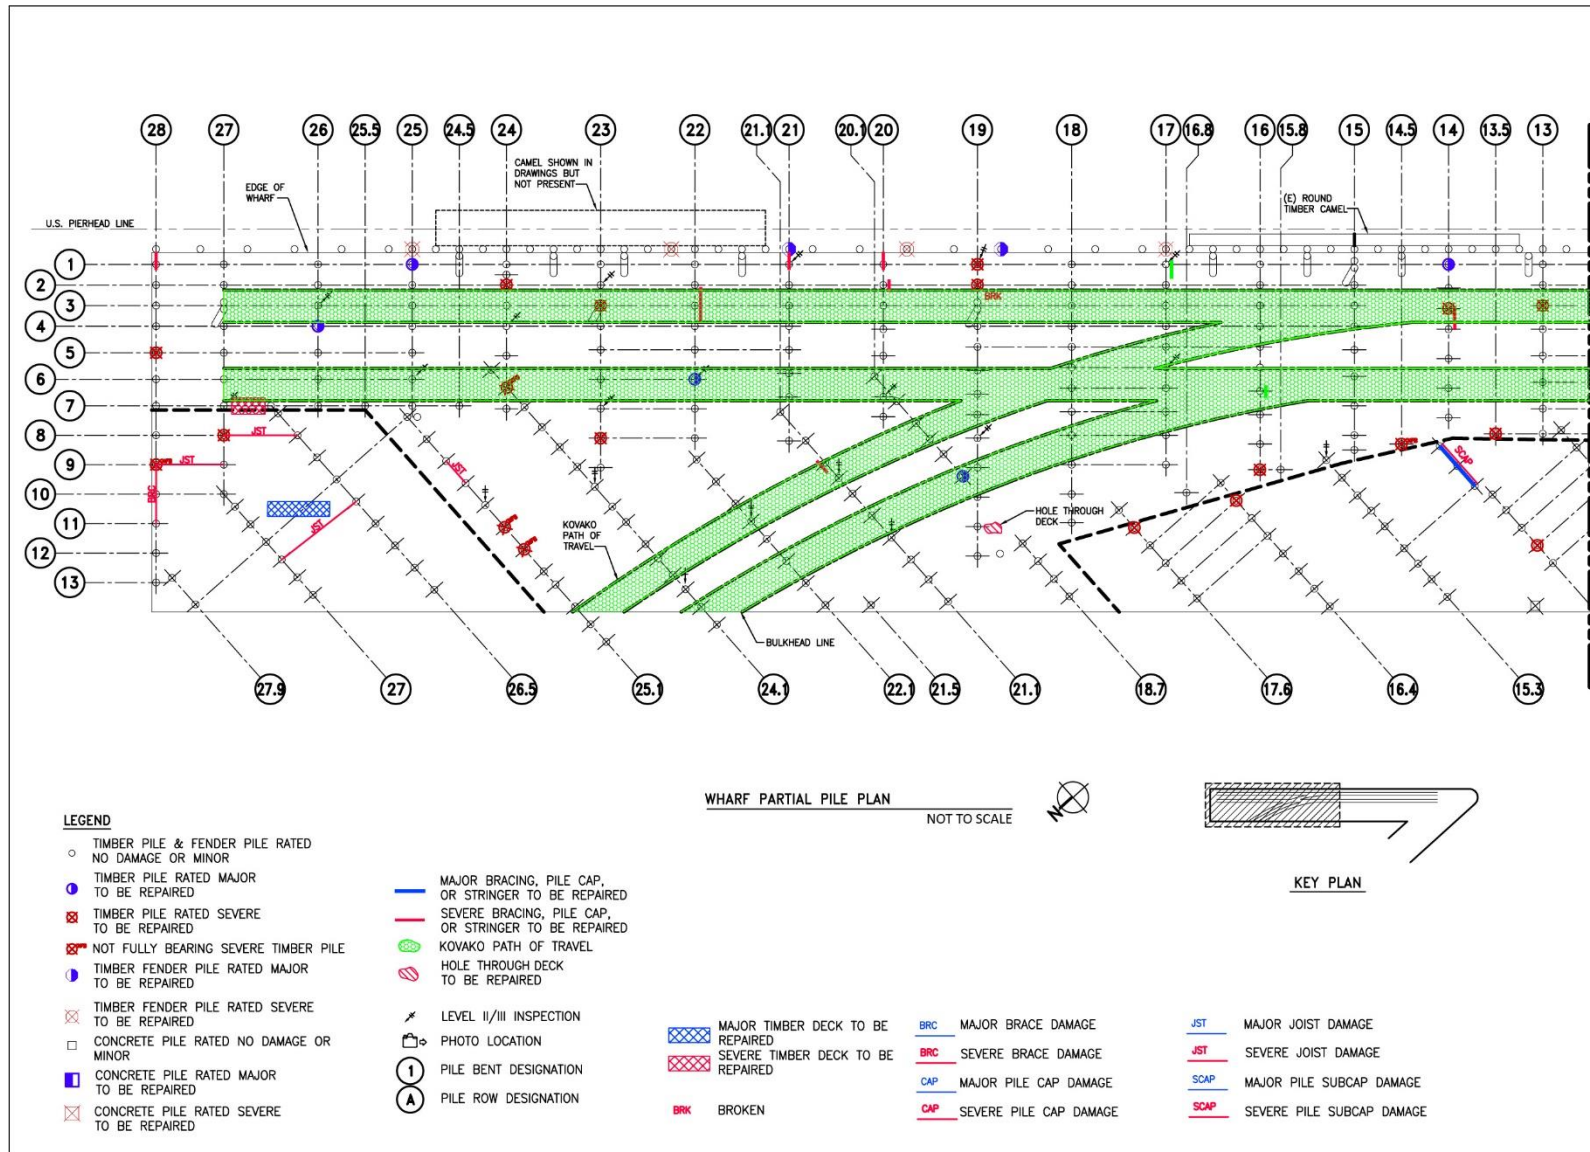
Proposed Wharf Pile Improvements – Segment 1
